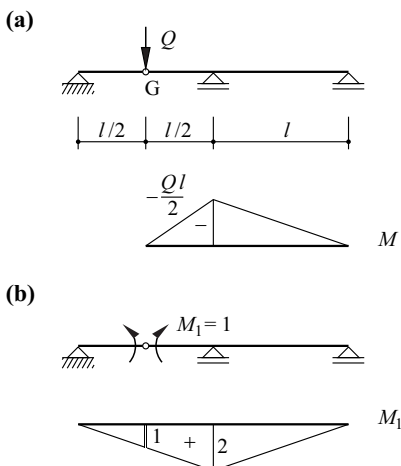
Hinged girder: (a) deformation state, (b) force state
